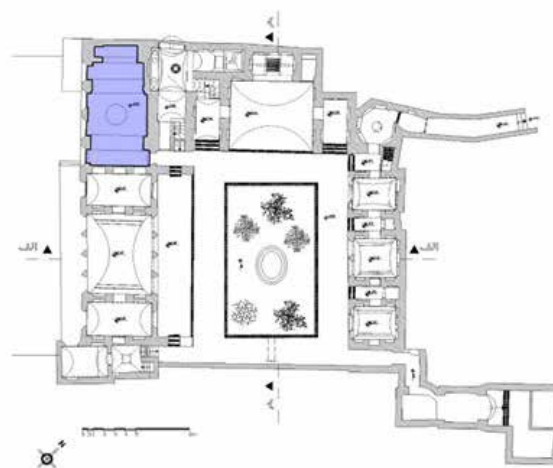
Ground floor plan of Oloomi’s house and the analyzed room. Source: authors.
